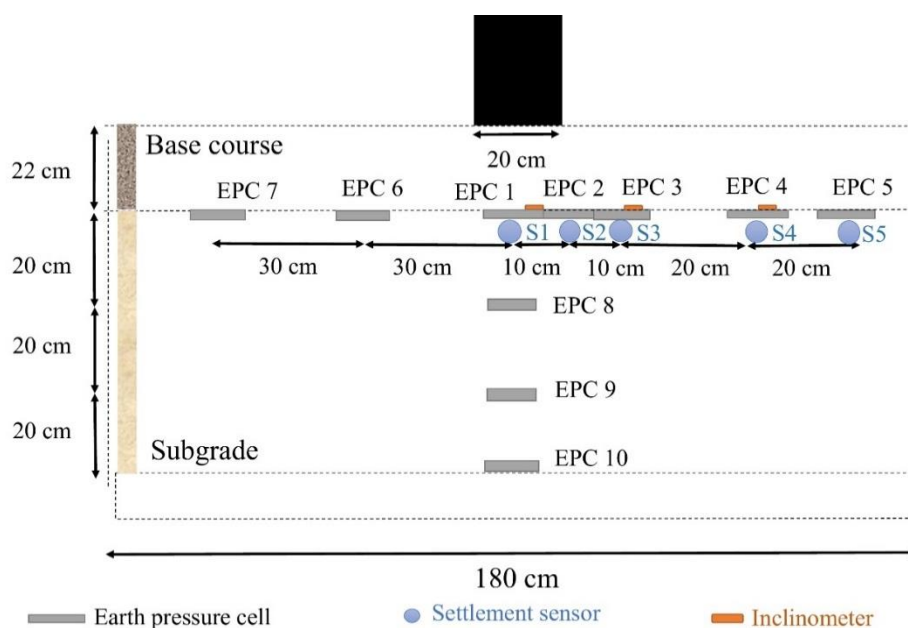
Sensors installation plan in the Traffic load test, a section.
